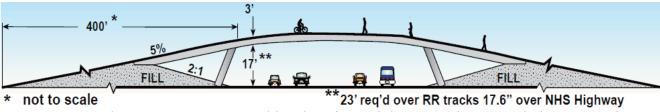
Pedestrian overcrossing adds a lot of travel distance when raised above a roadway
